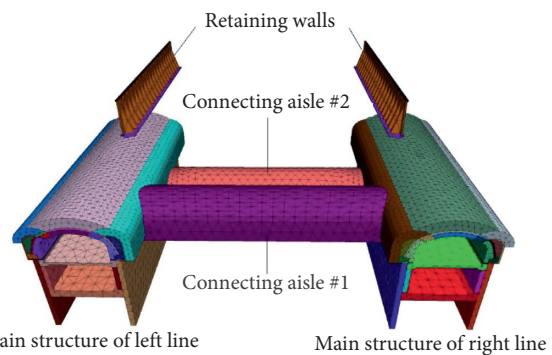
Spatial positions of the station structures and the retaining wall.
